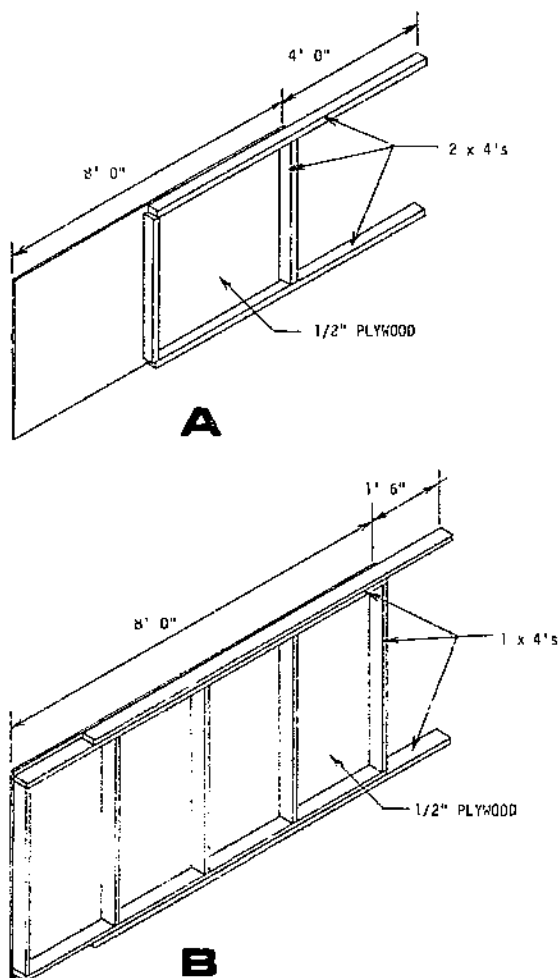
Foundation panel design. A, Original panel. B, Redesigned panel.
